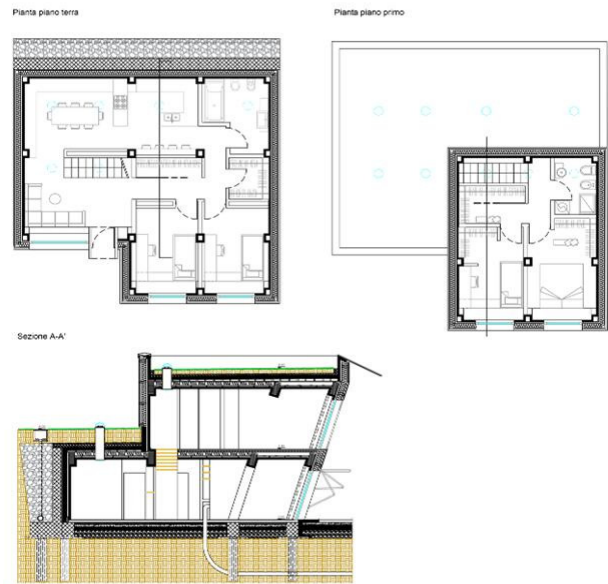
Plans and vertical cross section of the dwellings of 103 m².
